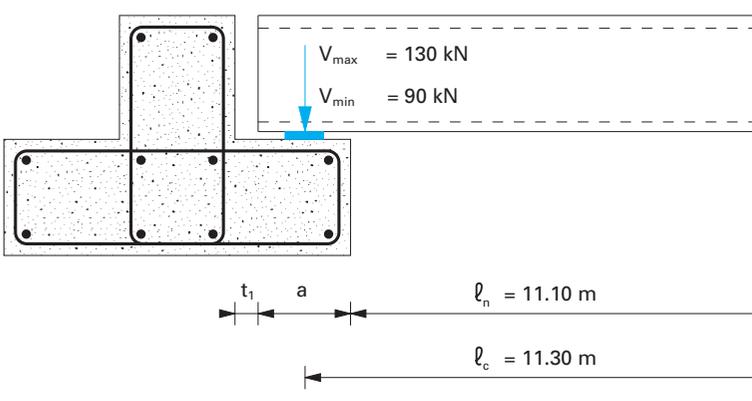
Nominal length "a" of support of a hollow core floor on a precast inverted "T" beam
